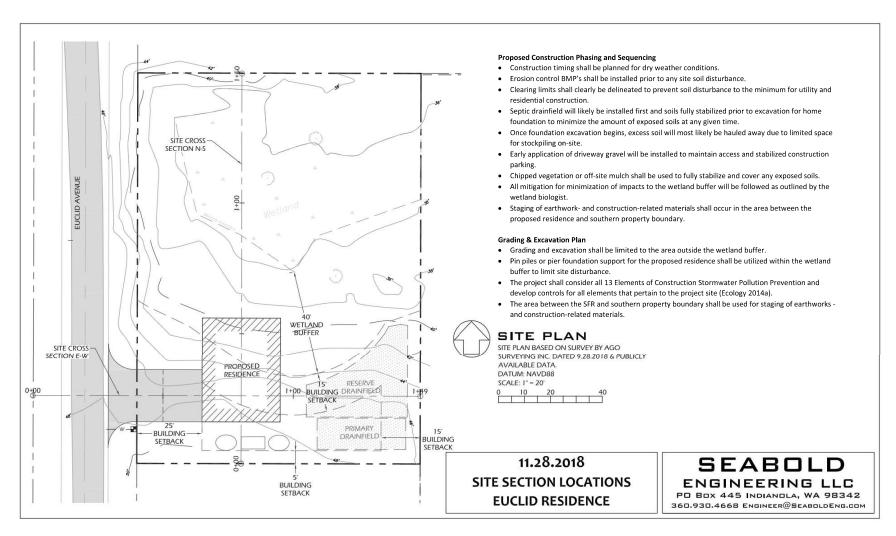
PROPOSED SITE DEVELOPMENT PLAN WITH CROSS SECTION LOCATIONS
